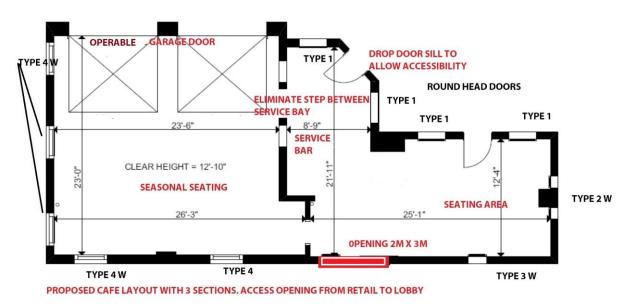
Plan of the garage with notes on the proposed layout with an accessible entrance shown in red. Source: Commonwealth
